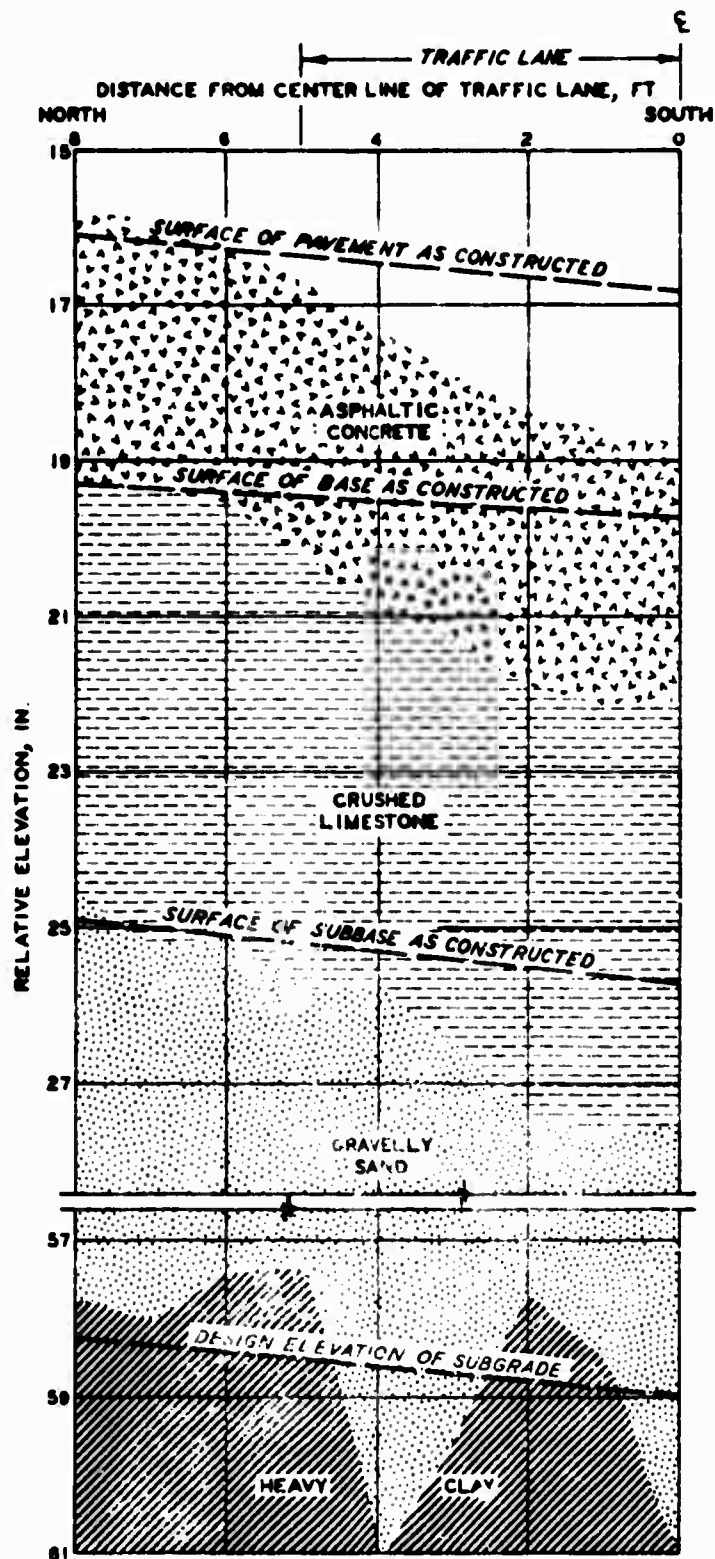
Test pit profile of item 5, lane 1, flexible pavement test section. Station 1+89 after 2500 coverages of 200-kip twin-tandem assembly
